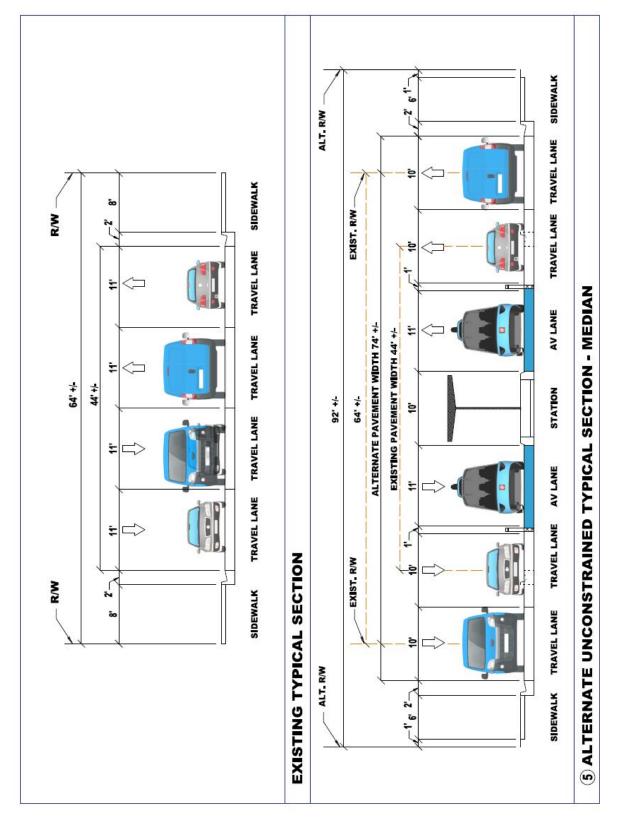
South Corridor Existing and Alternate Unconstrained Typical Section with Median Station - San Marco Blvd. North of Nira Street
